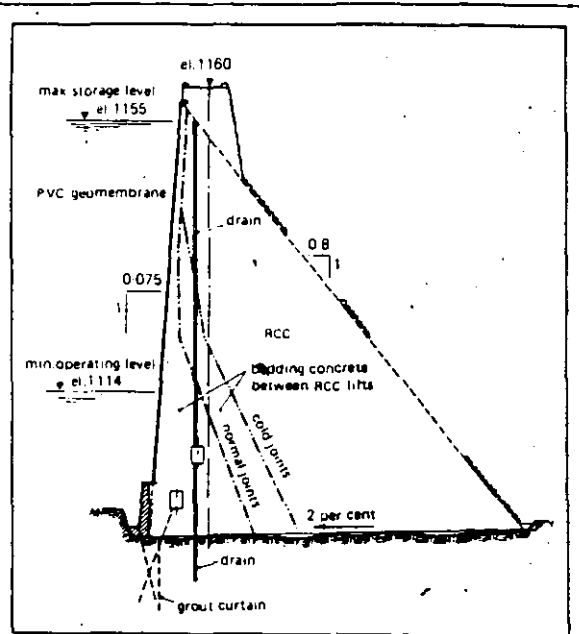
Typical non-overflow cross section of Concepcion dam.
